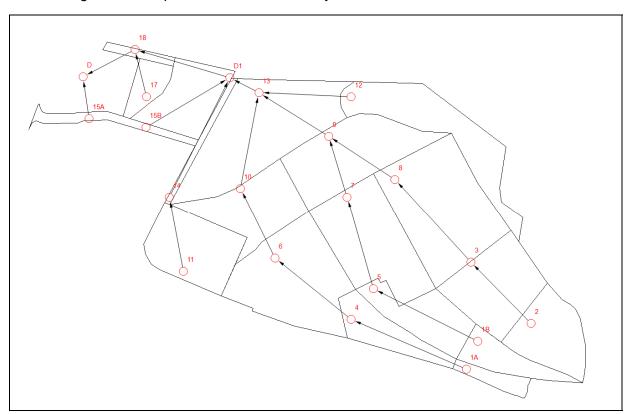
XP-RAFTS EXISTING CASE MODEL LAYOUT
